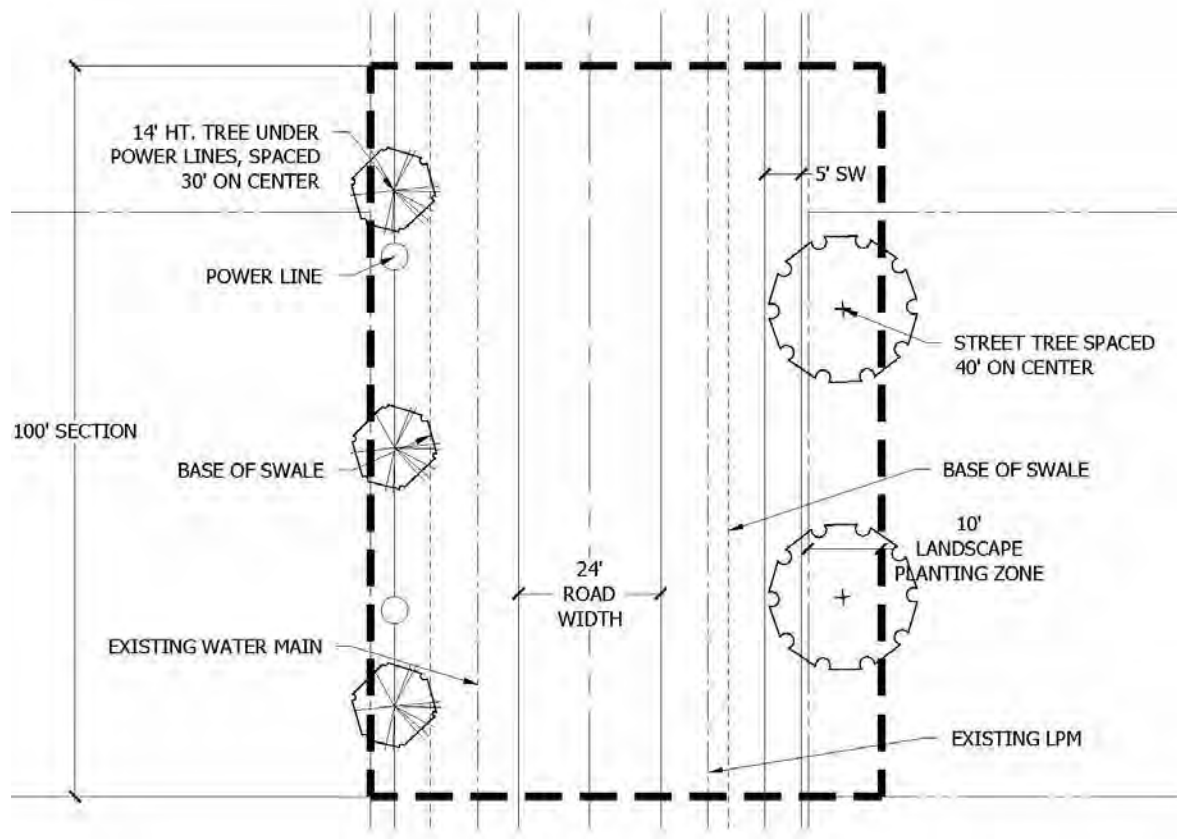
Typical 100-foot Plan View Section of 60-foot Right-Of-Way
